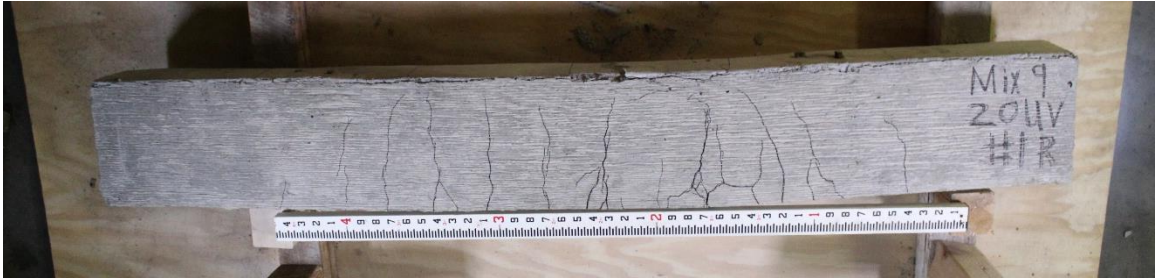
Mixture 9 (20UV) beam #1R: concrete beam side view.
